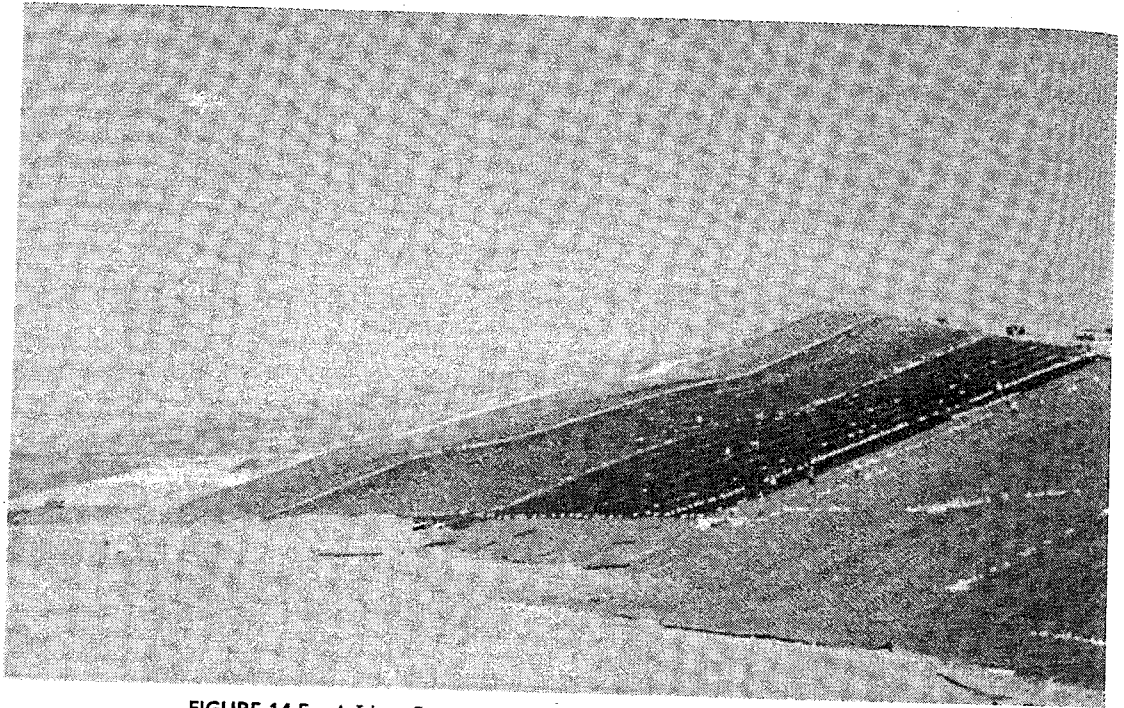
A Liner System Placed over an Existing Landfill for a Vertical Expansion Project
